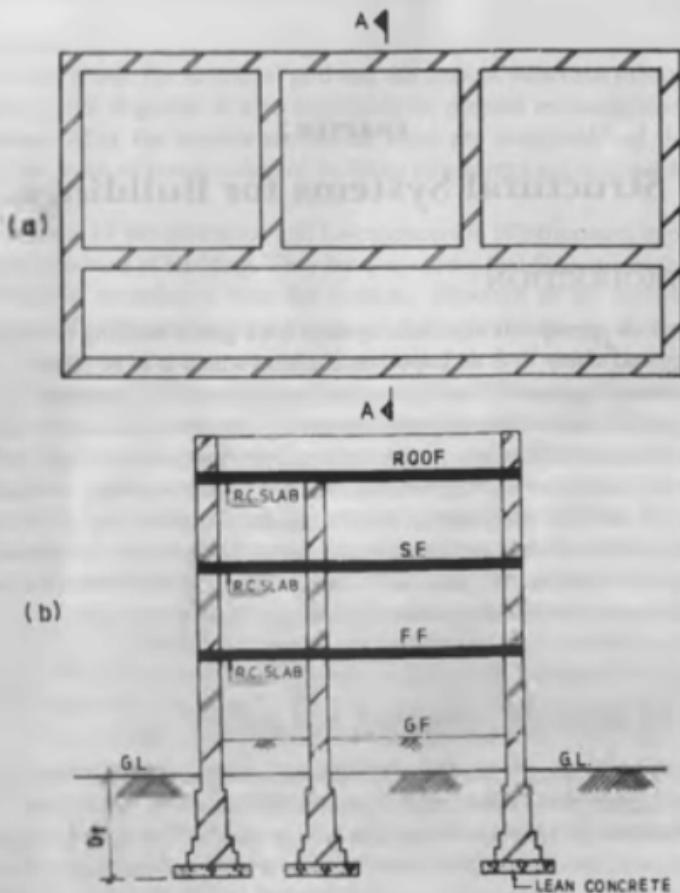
Structural system consisting of load bearing brick walls. (a) Plan of building; (b) Section A-A.
